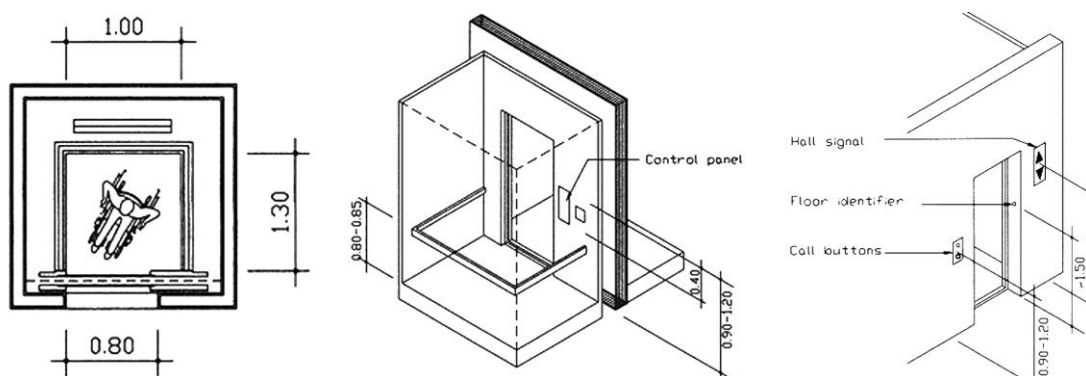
Plan, Interior and Exterior of Elevator (Goldsmith, 2000, p.63)
